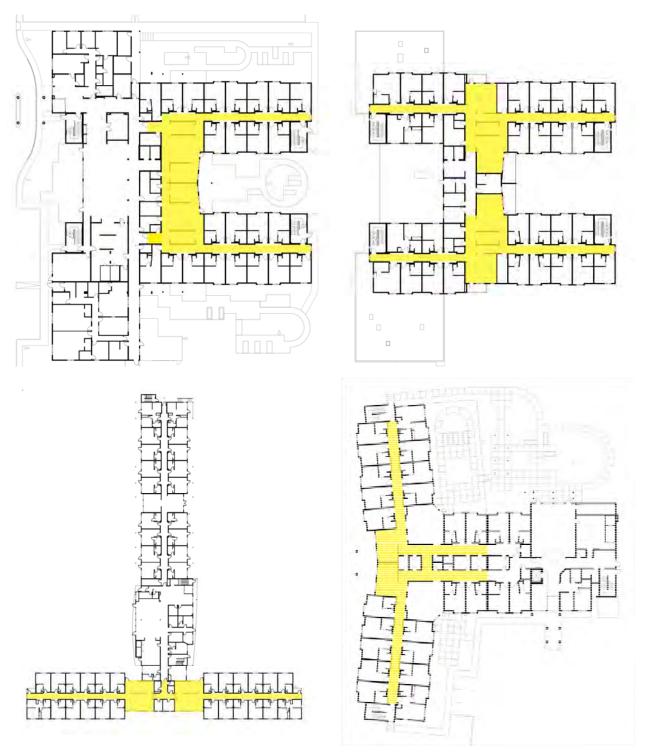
Wandering Space in Different Dementia Care Cottages Lawrence's L/U-shaped space on the ground floor of Red Deer building (left-up); Lori's I-shaped space on the second floor of Red Deer building (right-up); Jim's I-shaped space in Wainwright building (left-down); Gloria's L-shaped space in Slave Lake building (right-down).
